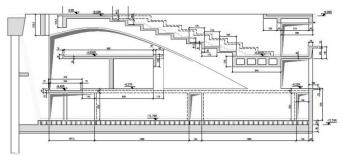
Concrete basement: typical section where one of the concrete arches converge into the retaining structure collaborating supporting the horizontal load STEP 1
